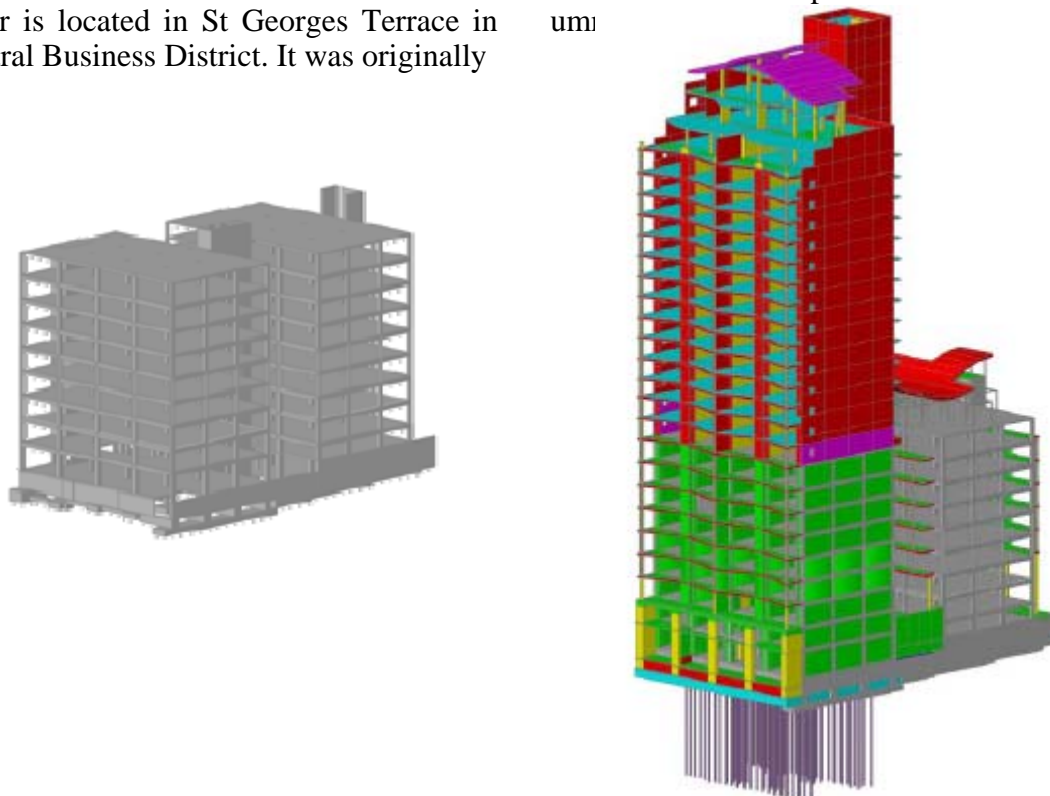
Left: Oakleigh Building; Right: Condor Tower
